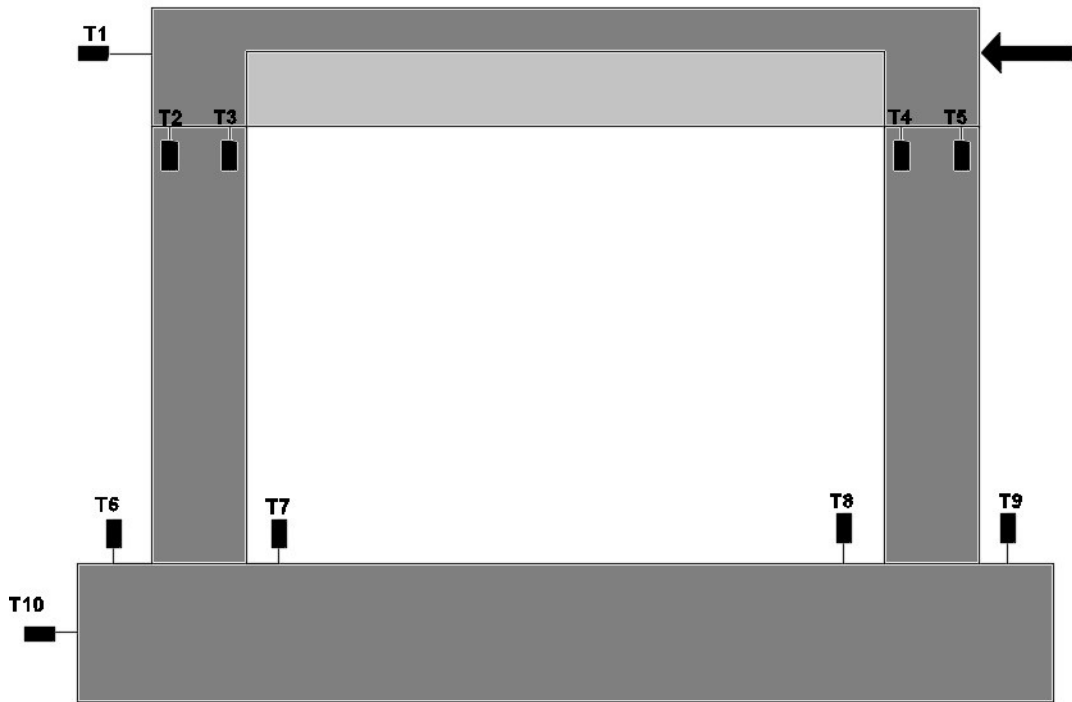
LVDTs used in test setup-view of specimen front side.
